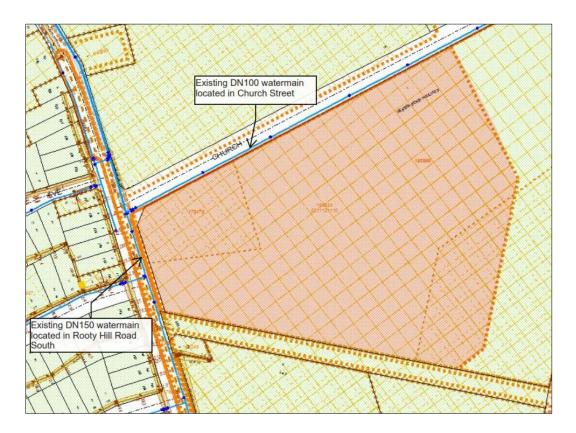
Sydney Water Hydra plan showing the location of existing potable water infrastructure. Source: Sydney Water (eDeveloper)
